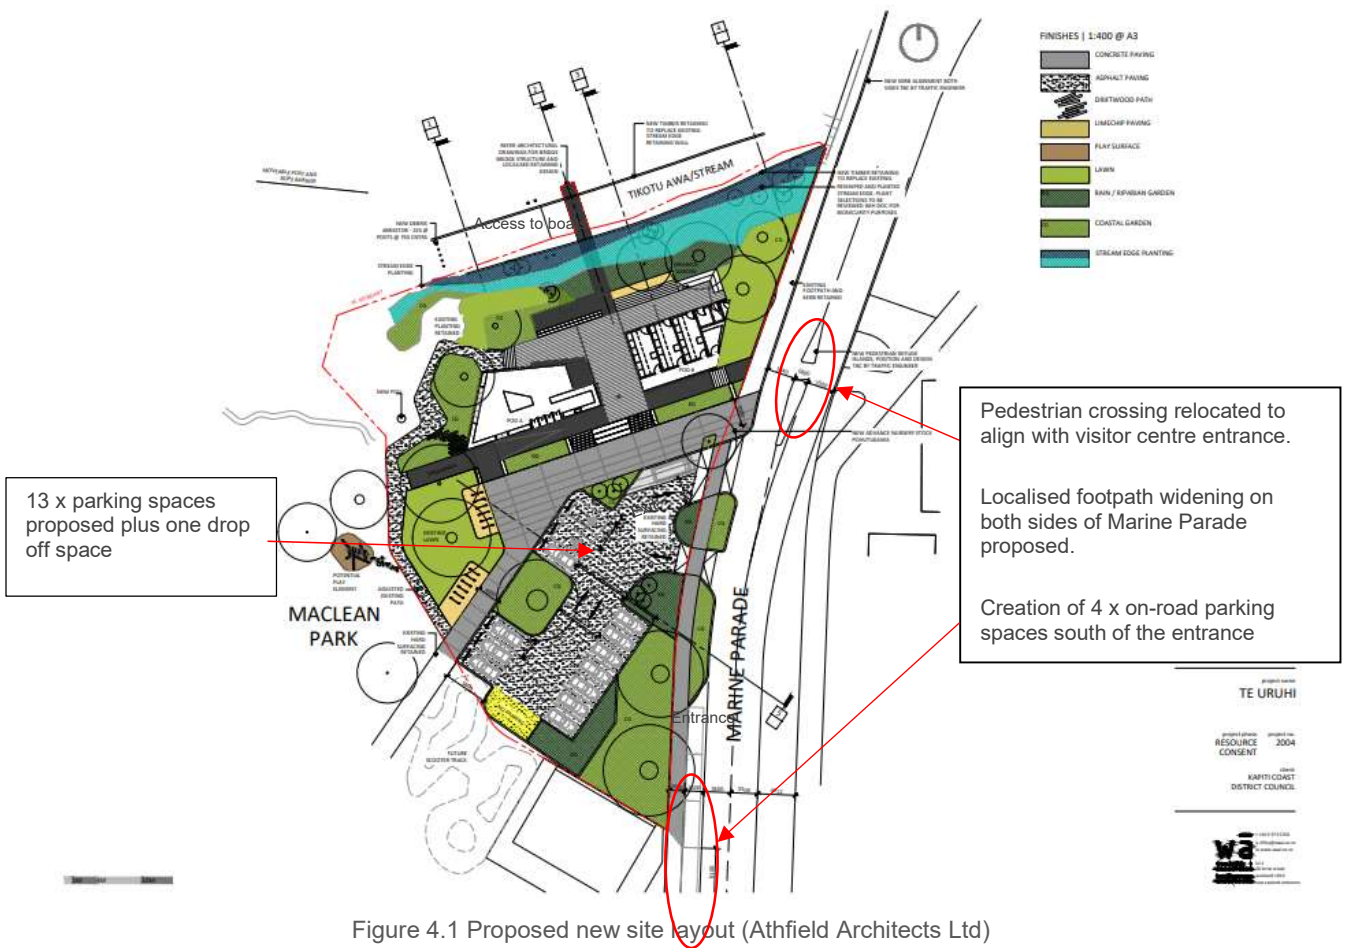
Proposed new site layout (Athfield Architects Ltd)
